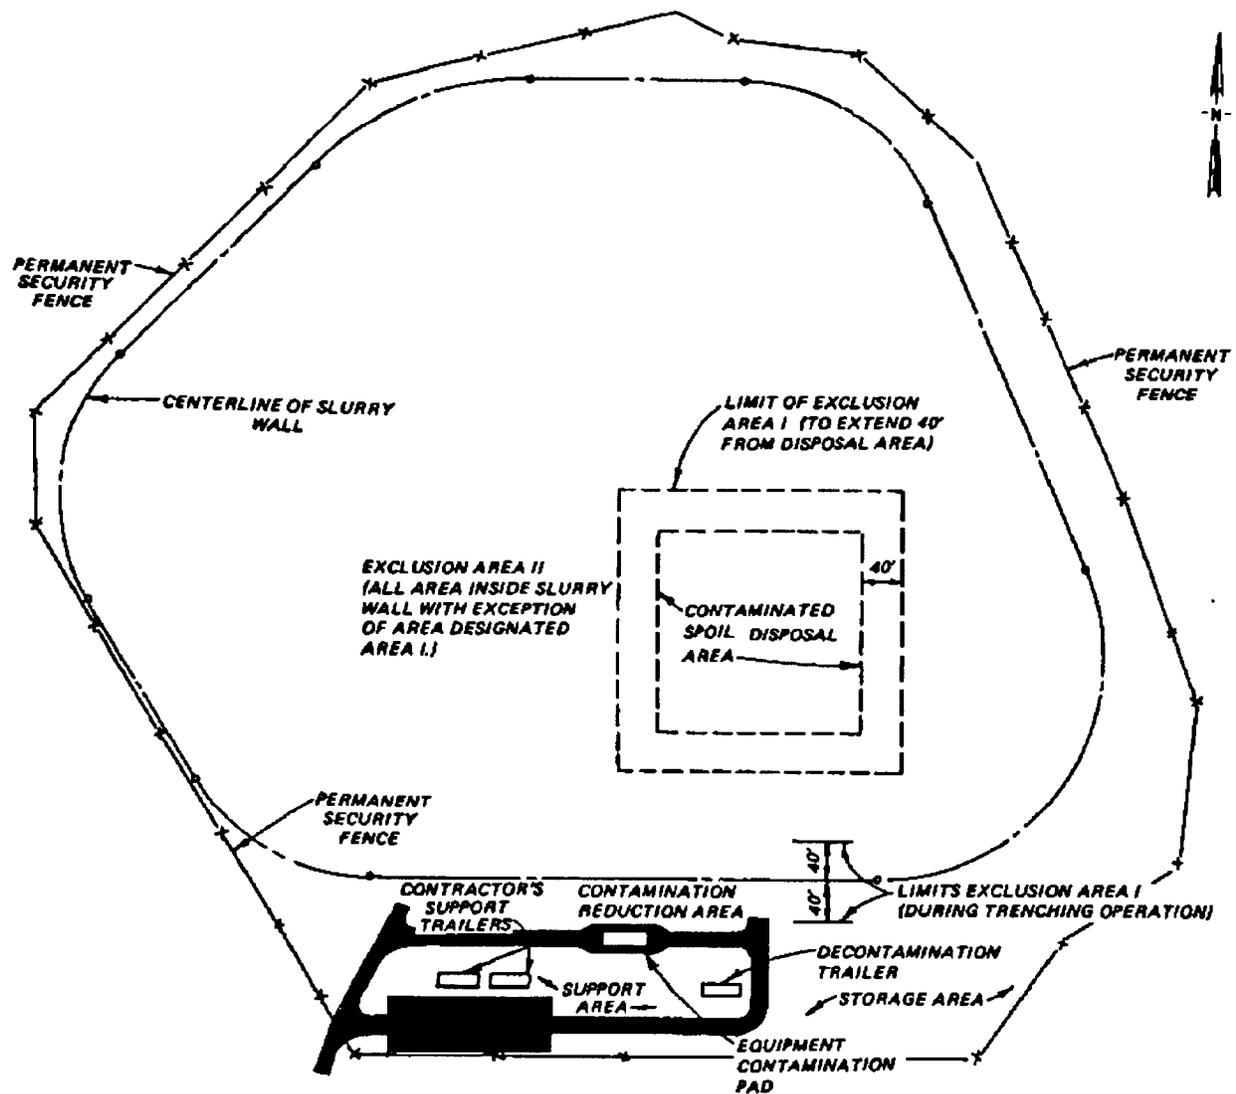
Design Drawing for Lipari Landfill Slurry-Trench Cutoff Wall
